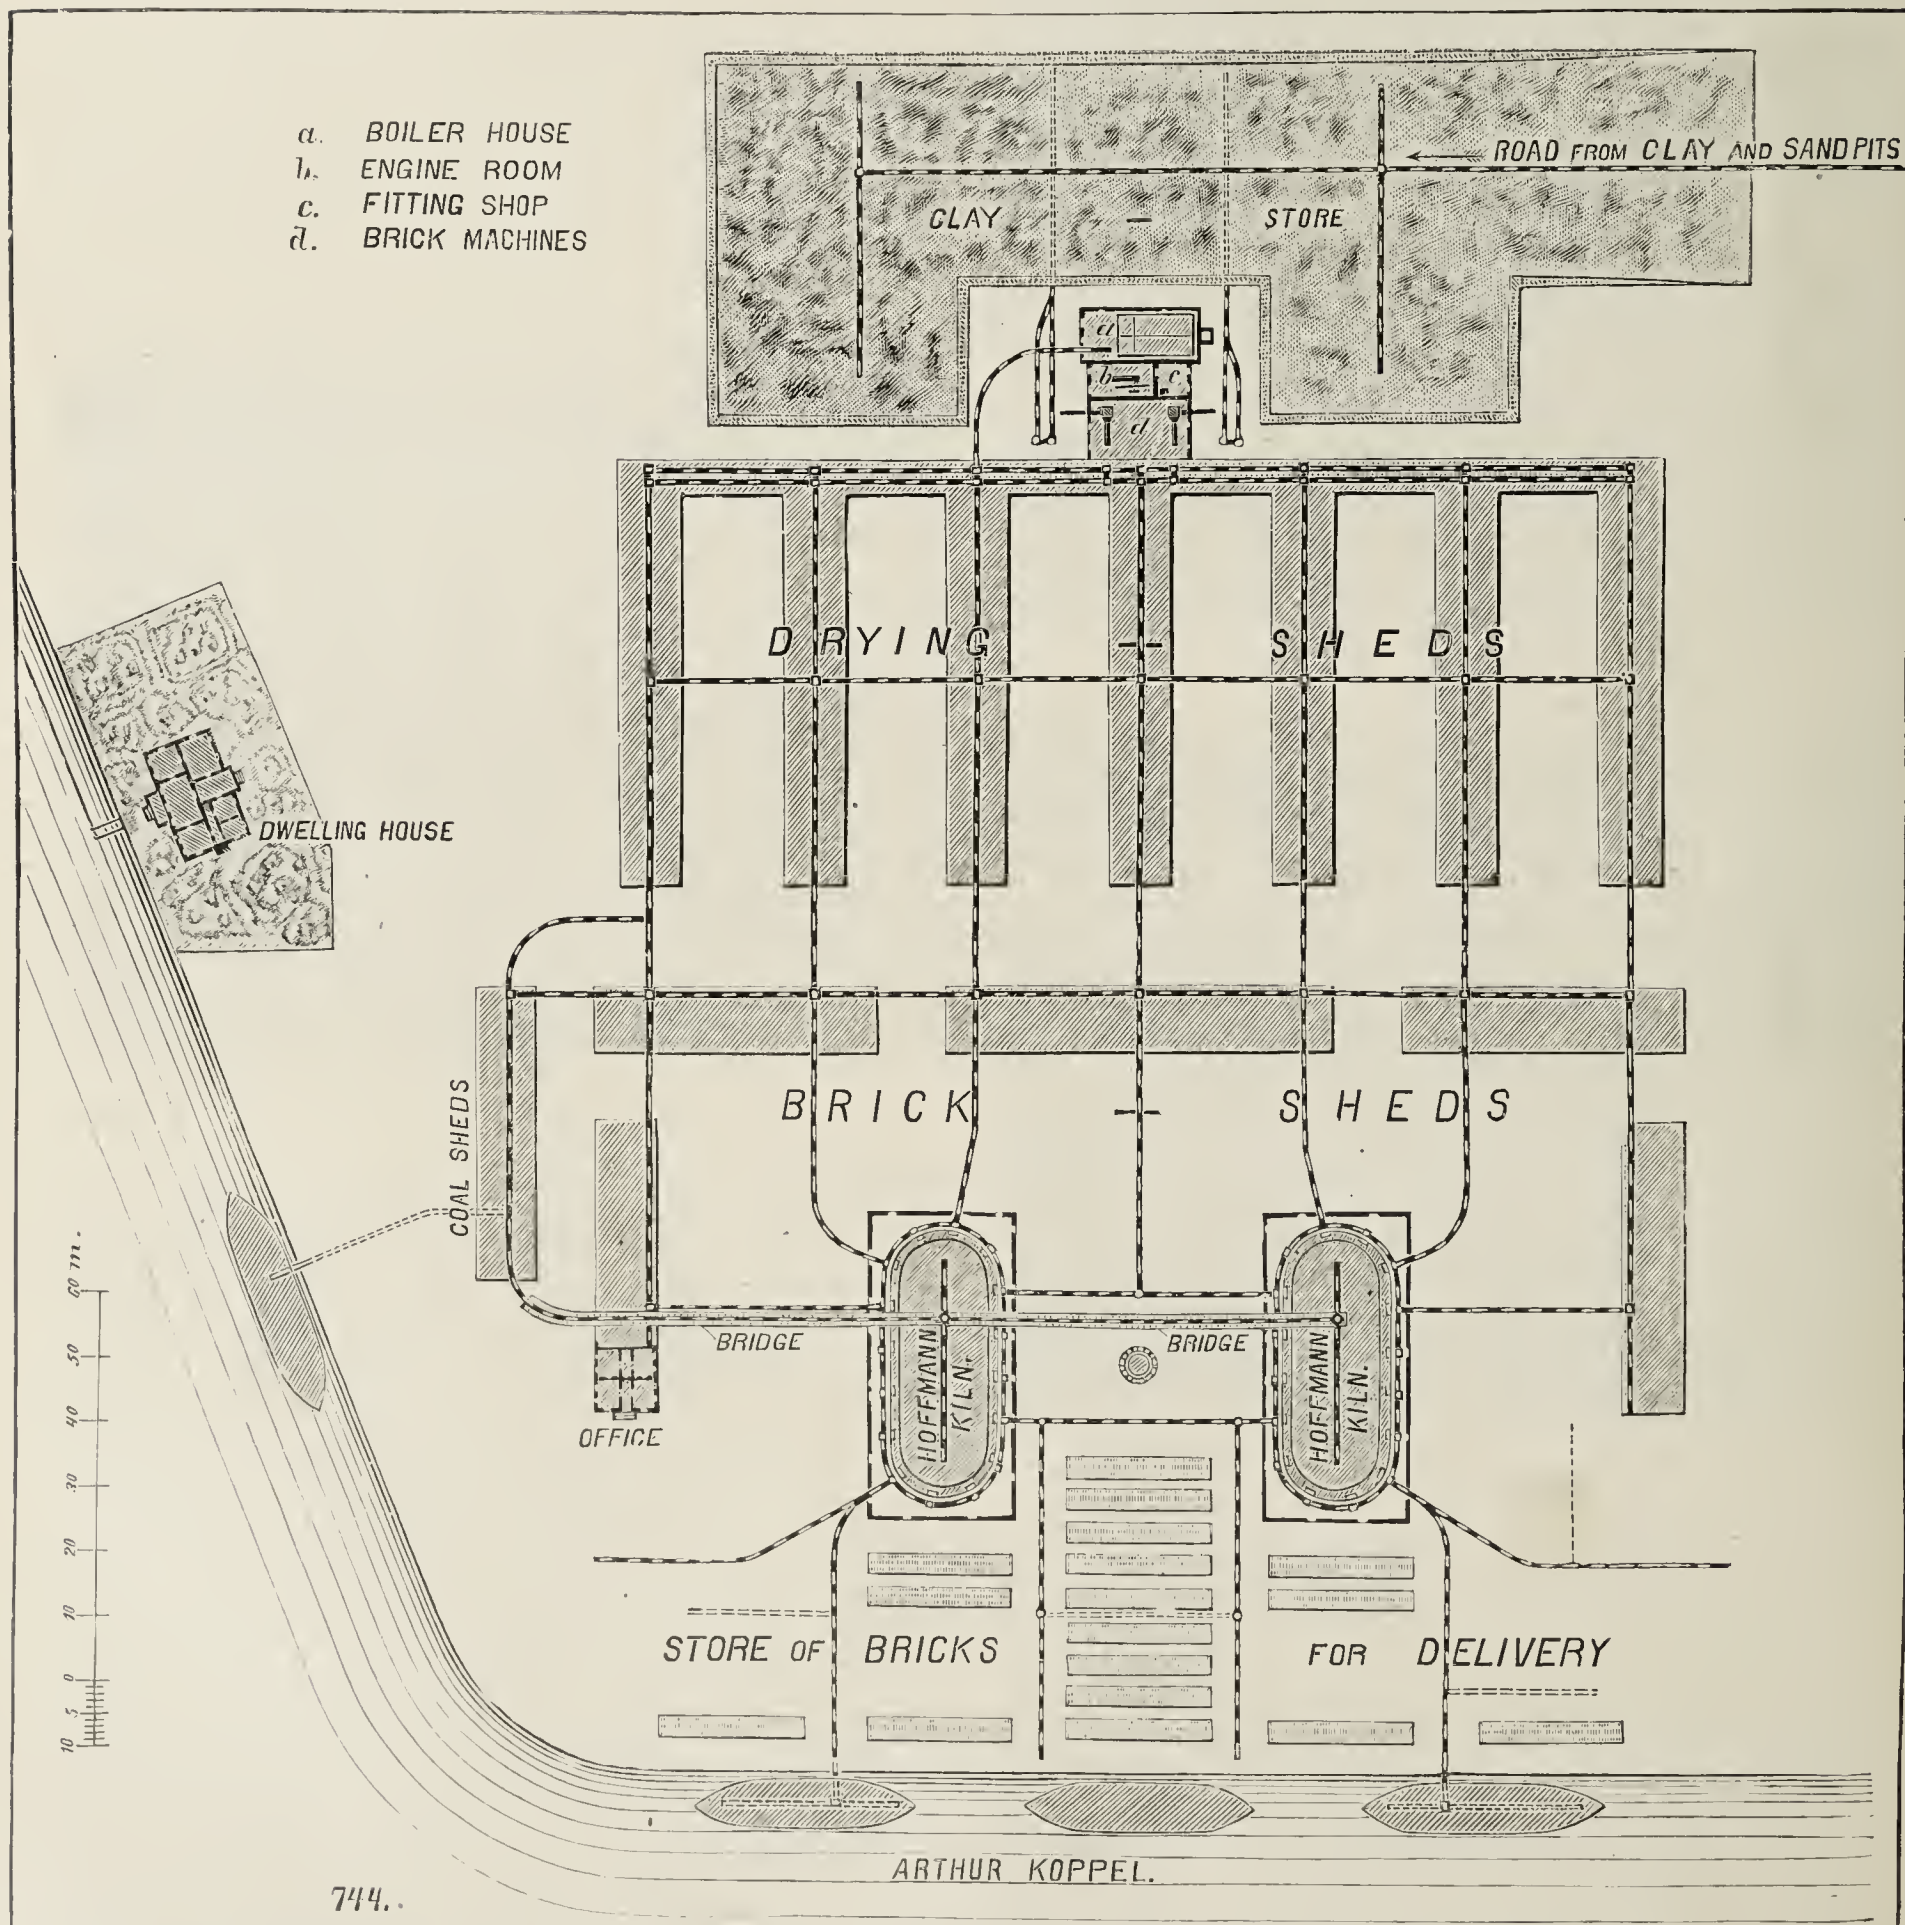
Portable Track Equipment as Installed in a Brick Plant, Showing Plan for Entire Plant.
